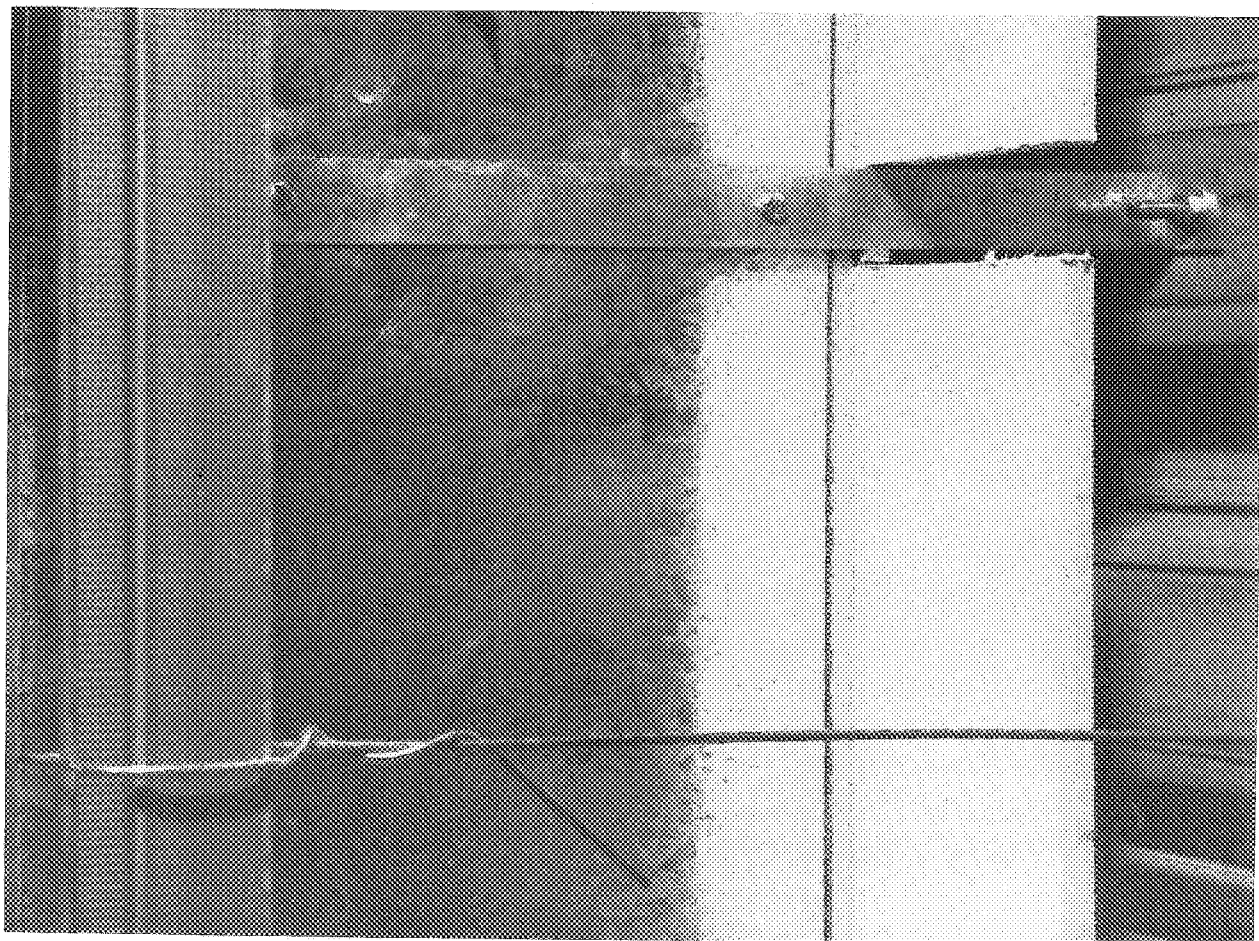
DUCT STRAP HANGER (ASSEMBLY NO. 2)
